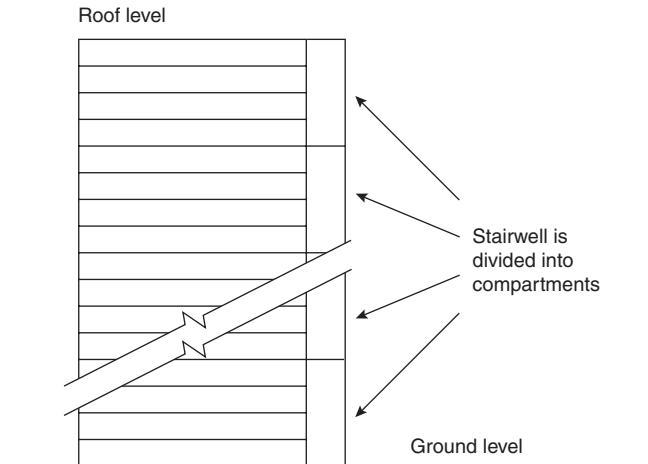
Compartmentation of a pressurized stairwell. Note: each four floor compartment has at least one supply air injection point.
